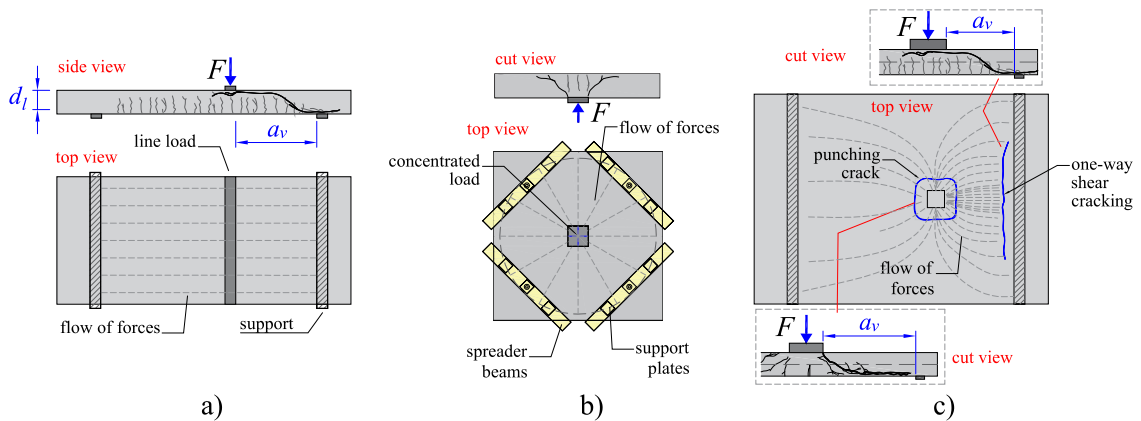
One-way slabs loaded over the entire width failing in one-way shear; b) slab-column connections failing in punching; and c) one-way slabs under concentrated loads subjected to both one-way shear and punching shear failures (adapted from [12]).
